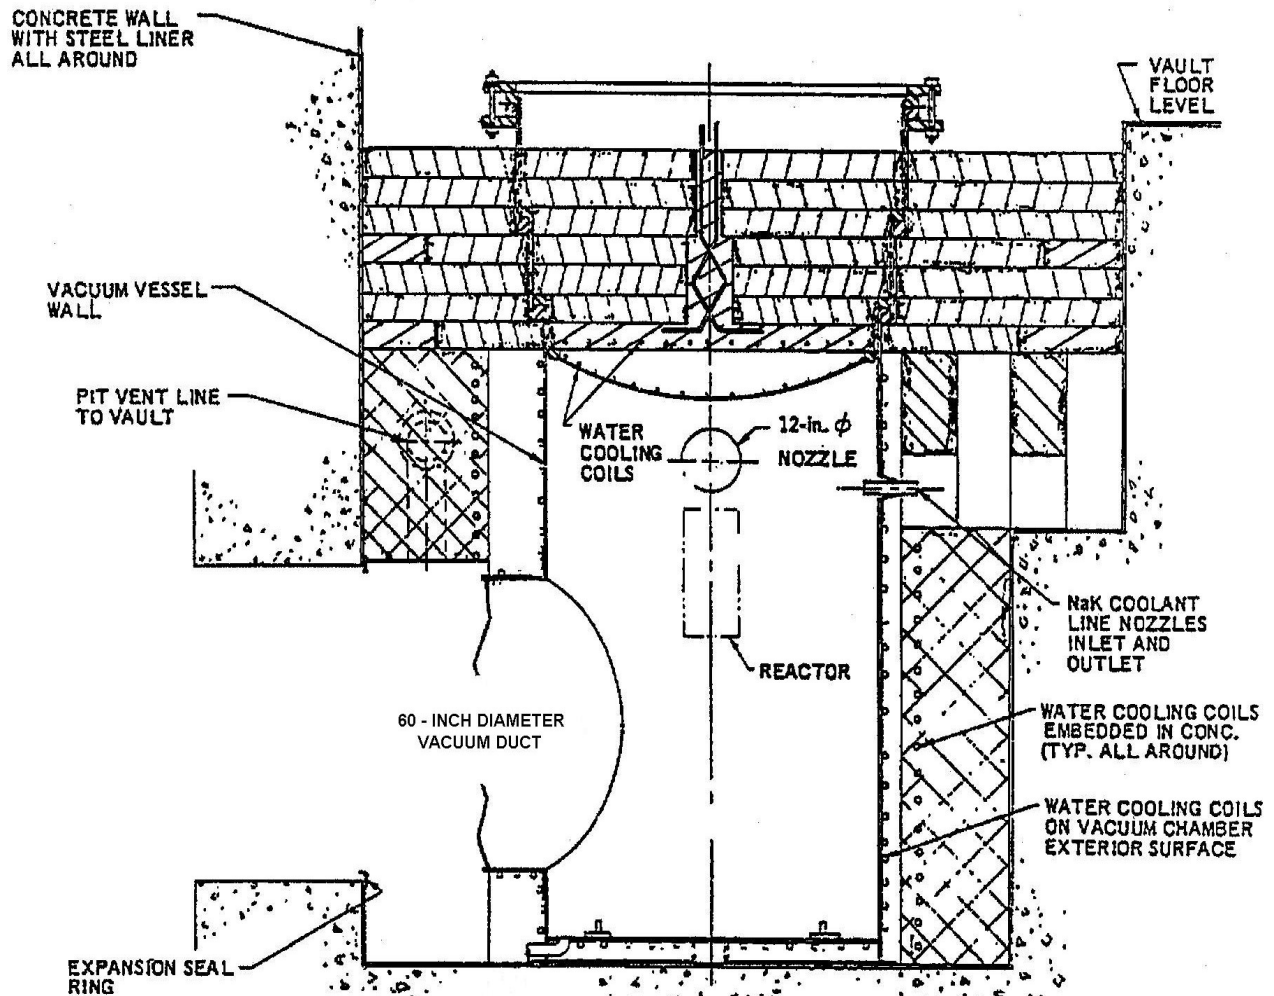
Elevation View of Below Grade Vault, Test Cell, and West Addition
